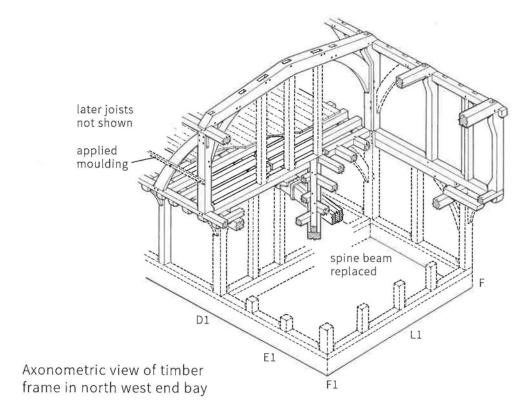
Reconstruction of timber framing of 22-24 Kirk Gate. [© HEA XA00315.]
